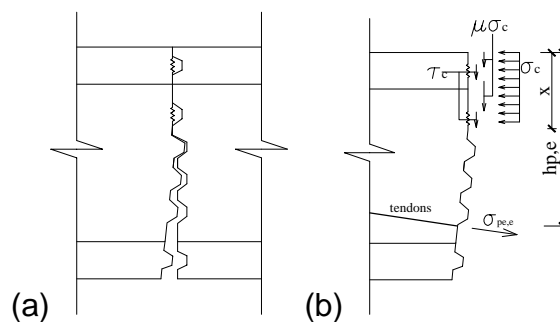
Simplified failure mode for dry joint under combined shear and bending: (a) Failure mode; (b) Forces in failure plane
